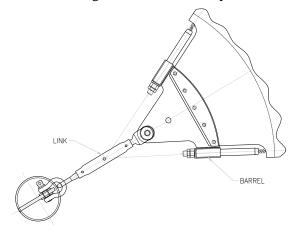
Typical Corner Membrane Plate Detail - Diving Pool Canopy, Changi Naval Base
